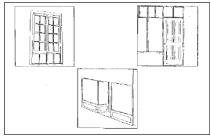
Typical Window and Door Detailing in Commercial Buildings in Traditional Rural Commercial Centres (extracts Design Guidelines for Rural Townships).
